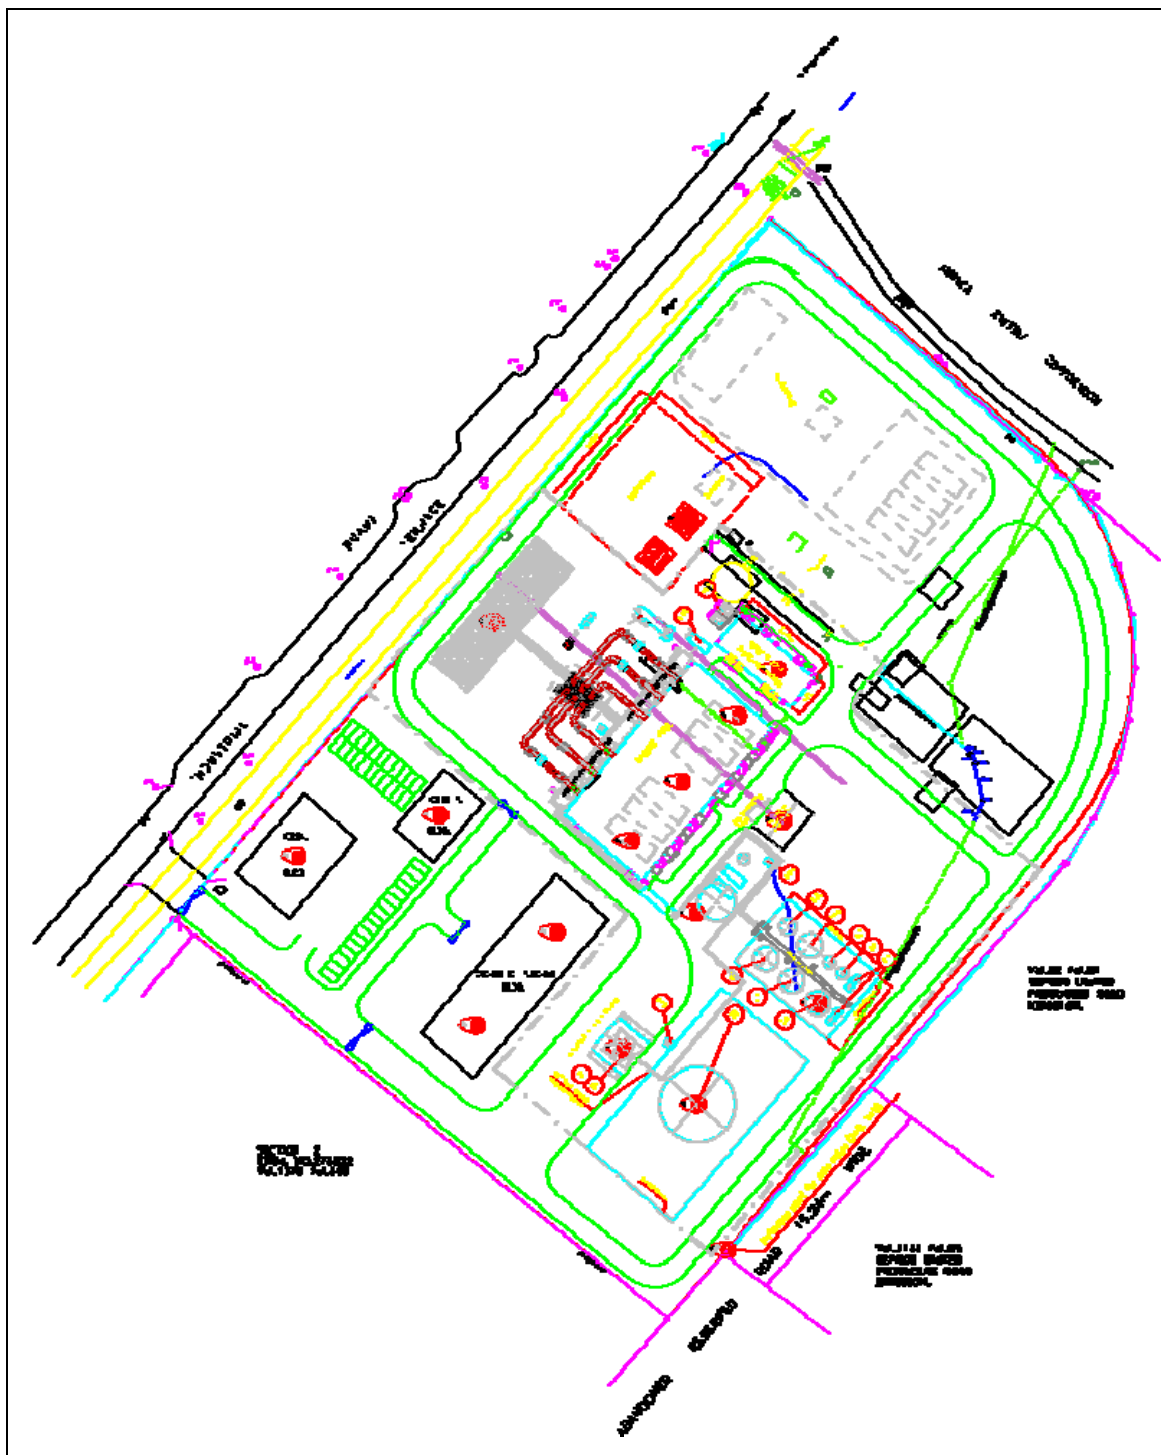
Schematics illustrating the plan view of the proposed JEP West Kingston 60MW power plant
